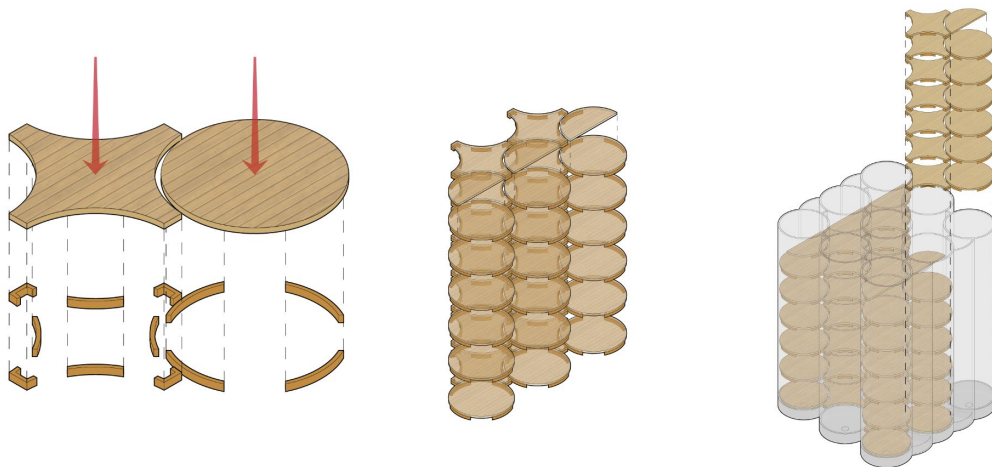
Strategy for installation of mass timber flooring and beams into existing concrete columns. Image Credit: Author
